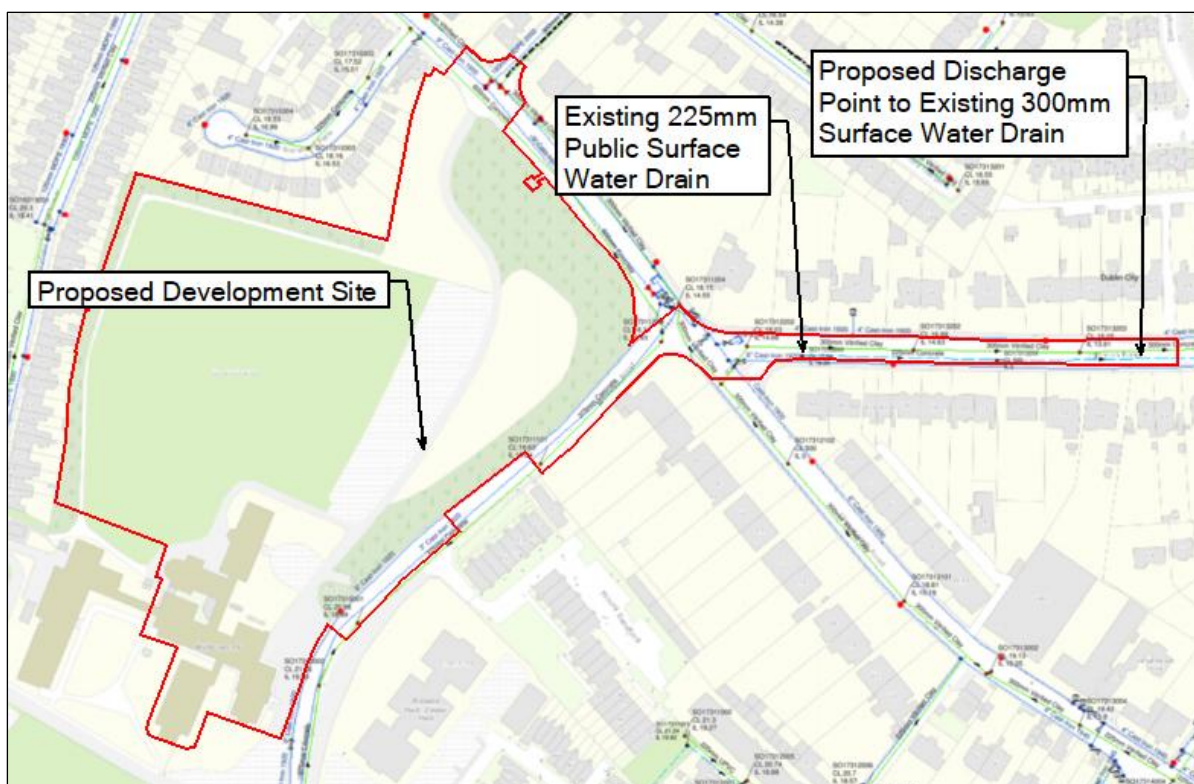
Extract from Uisce Eireann's Network Plan (Site Boundary Indicative Only)
